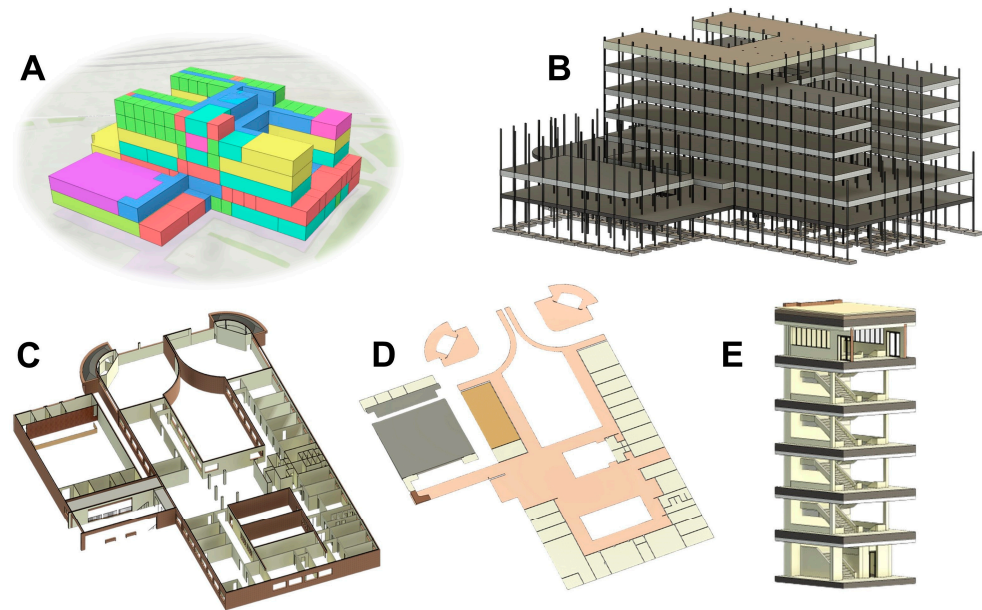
Features of the detailed building information model (BIM) of the School of Surveying, Geodesy and Cartography Engineering: (B) building structure; (C) 3D model of the main floor; (D) plan of the main floor; (E) 3D model of a staircase, from the basement to the top floor. The image in (A) shows the final, geometrically simplified 3D digital model of the school, which was used to create the digital twin.
